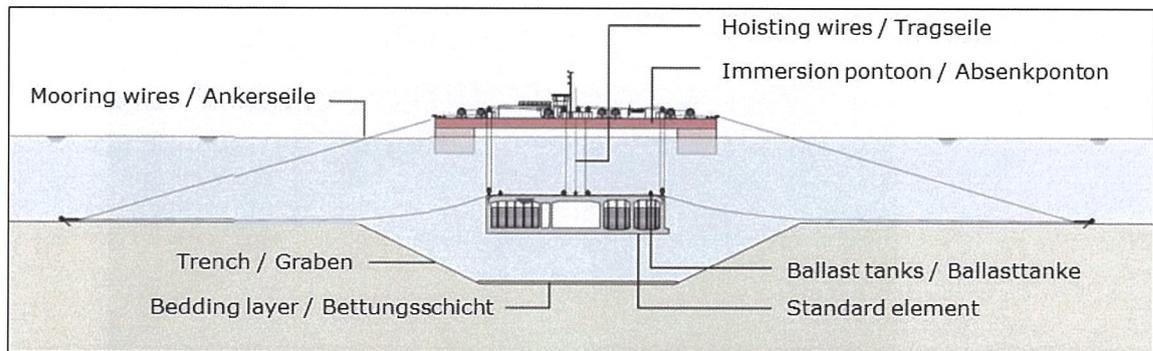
Immersion of a tunnel element from an immersion pontoon into the dredged trench with bedding layer.
